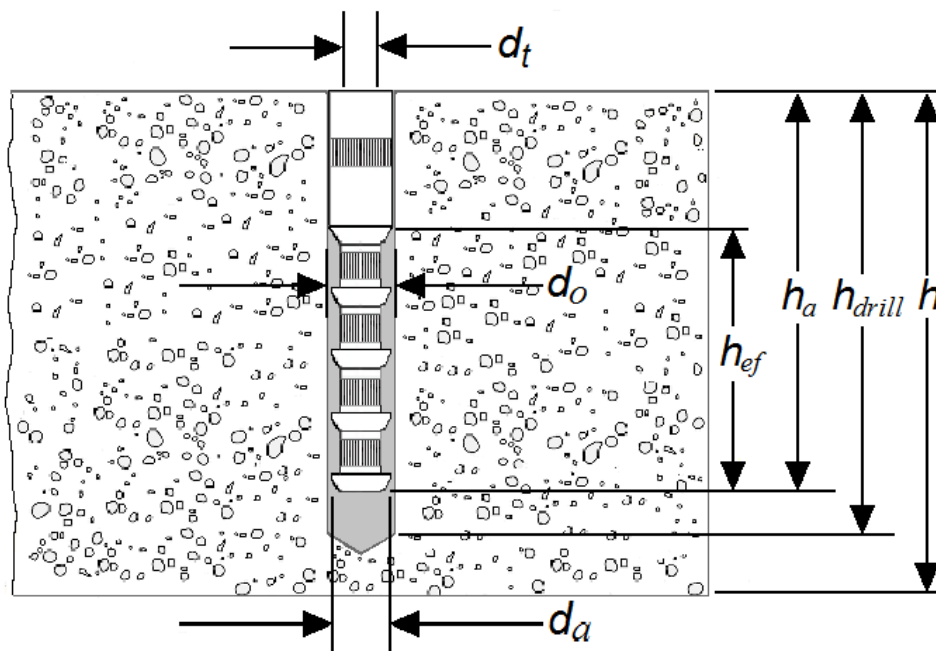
TYPICAL INSTALLATION DETAIL FOR POWER-SERT INTERNALLY THREADED INSERTS
